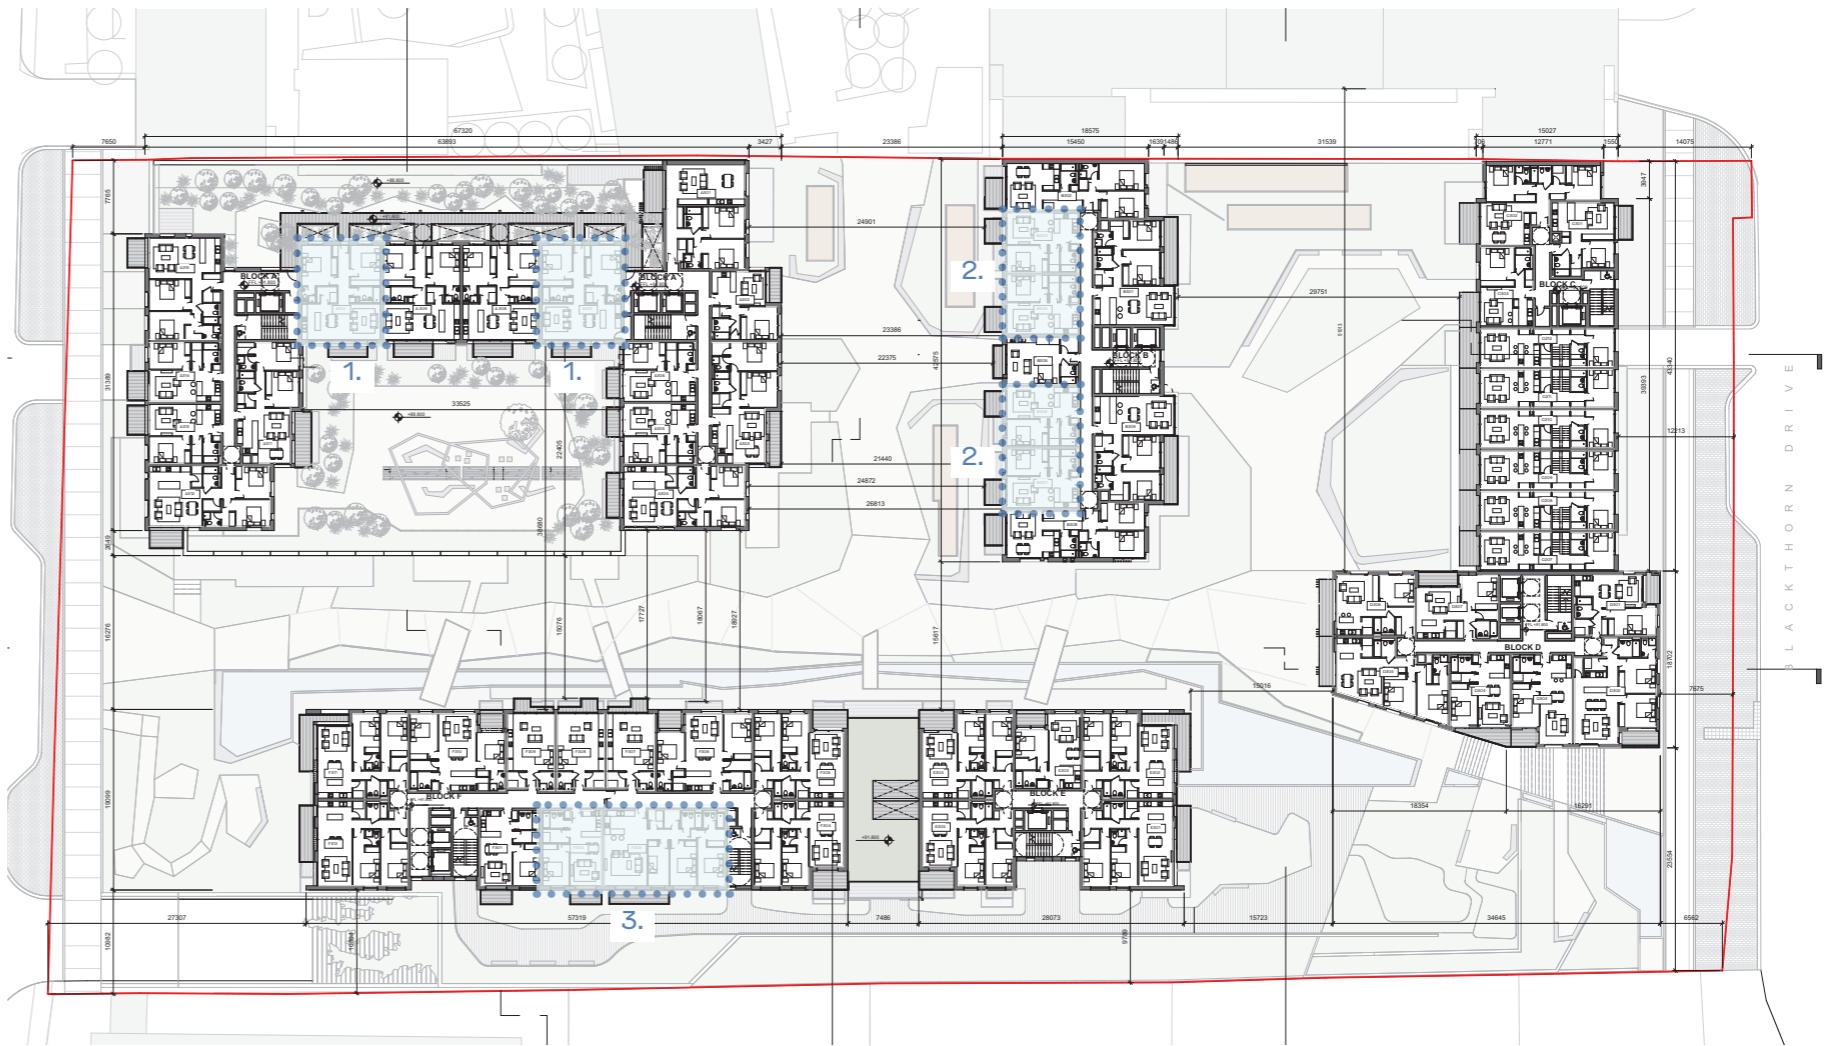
KEY PLAN (third floor plan) - SUMMARY REVISIONS
